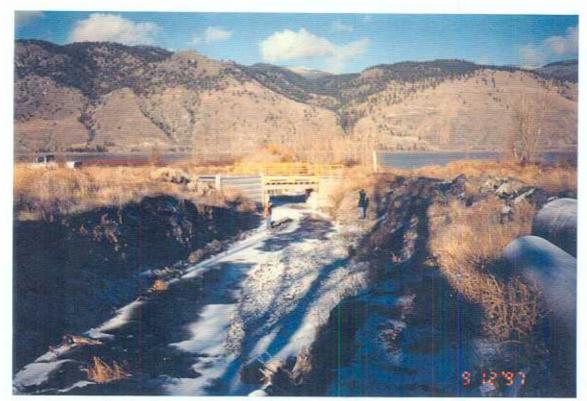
(Site 2) Approximately 30 metres upstream of bridge crossing Durand Creek looking north towards Kamloops Lake (December 9, 1997)
